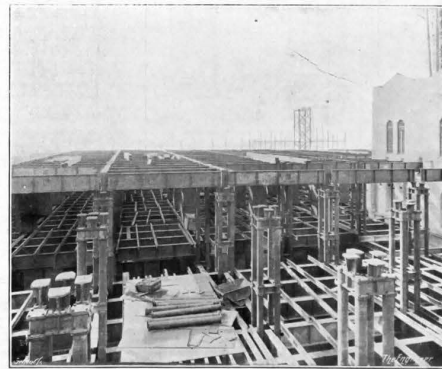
DEVOTO RESERVOIR—ERECTION OF THIRD FLOOR GIRDERS
